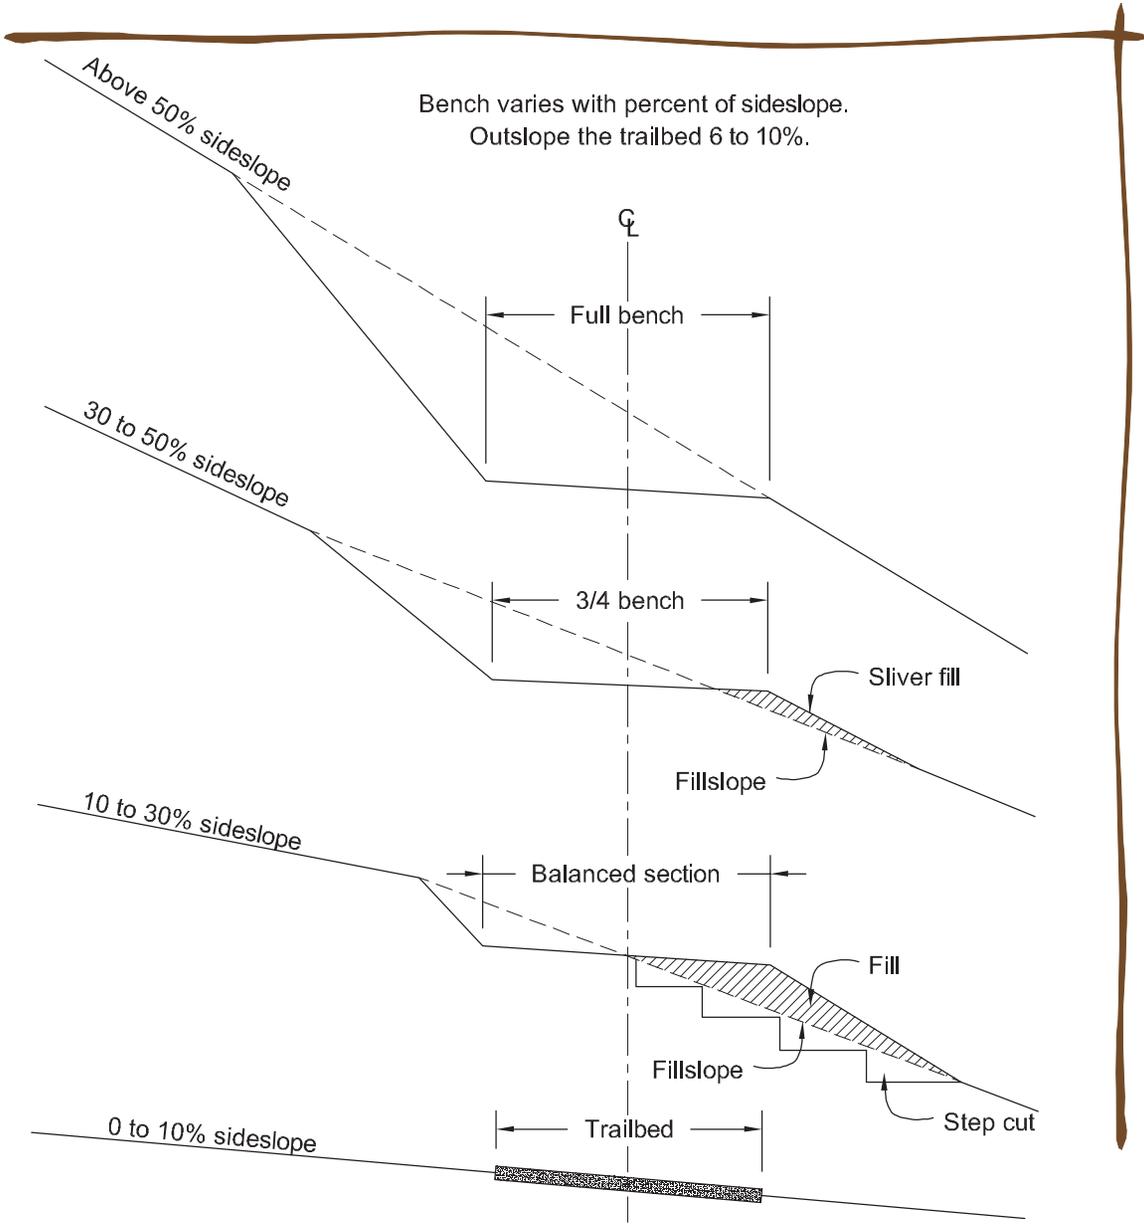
Trail typical cross sections. Full bench construction gives the fewest problems, especially on steep slopes.
